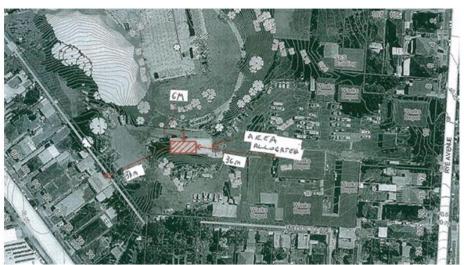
Plan showing the location of the proposed shed Source: Bayside Council, 2018
